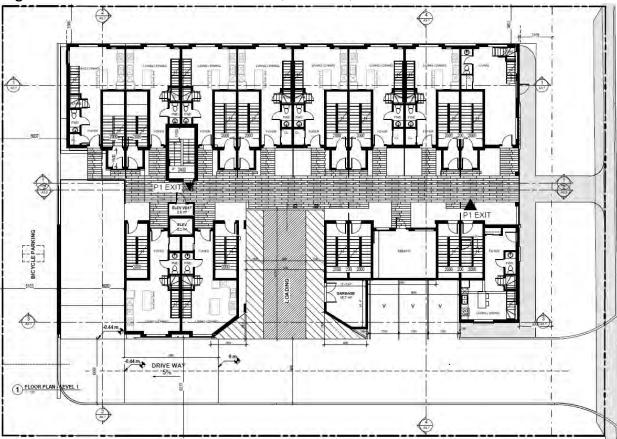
Level 1 Floor Plan – Unit Access (SRM Architects)
